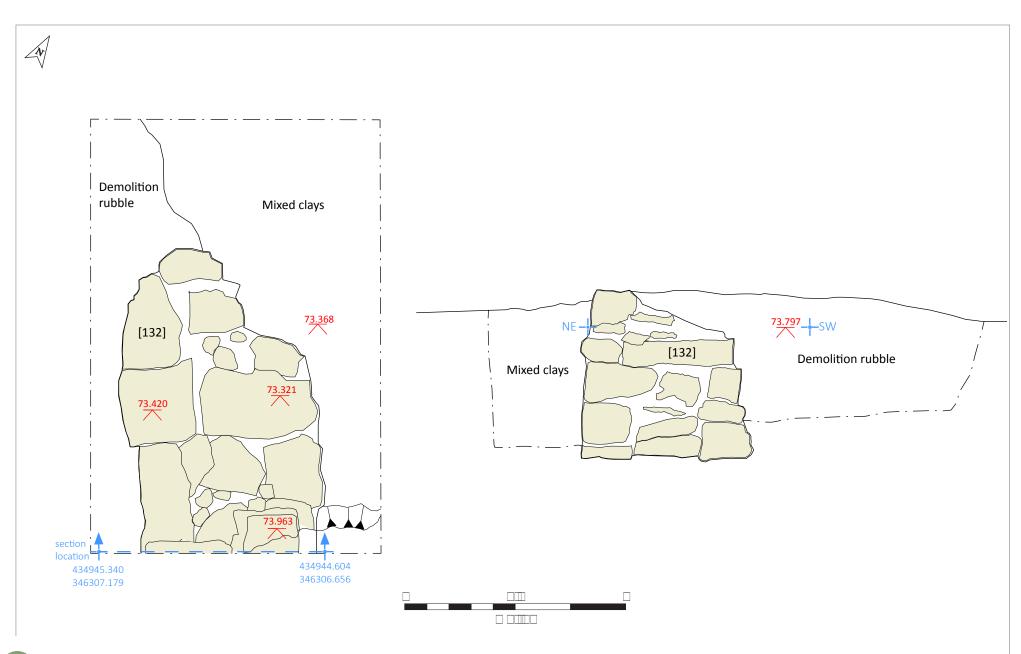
Plan and north-west facing section of structure [132] in the watching brief area
